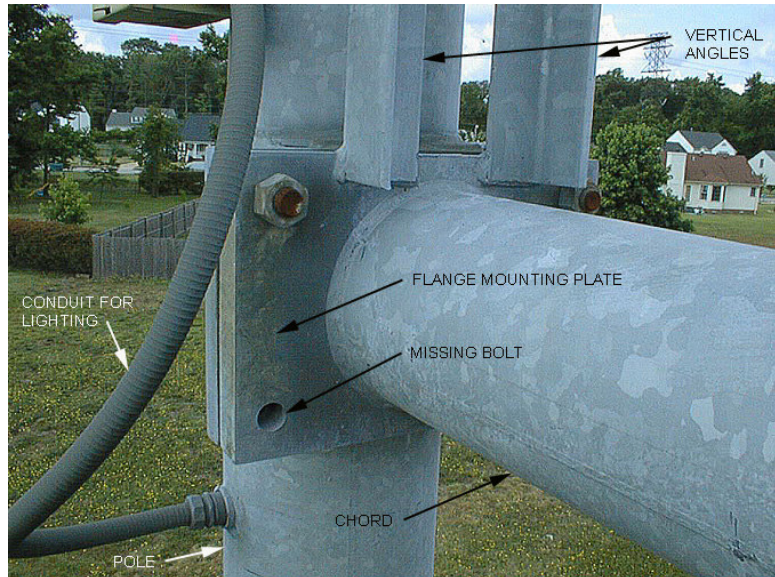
Connection of Chord Flange Plates to Flange Plates on Pole Support
